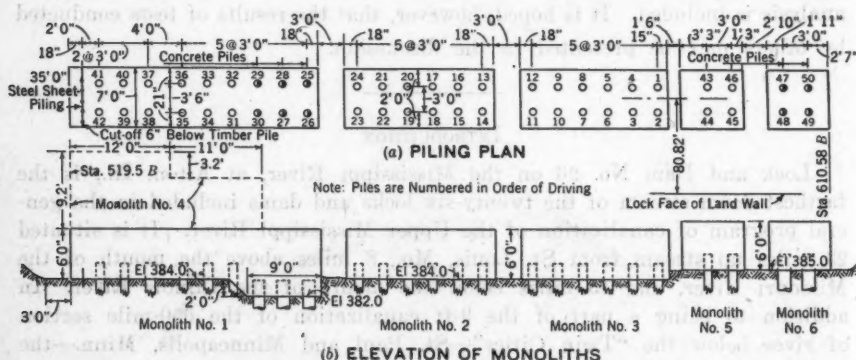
PLAN AND ELEVATION OF TEST MONOLITHS.
